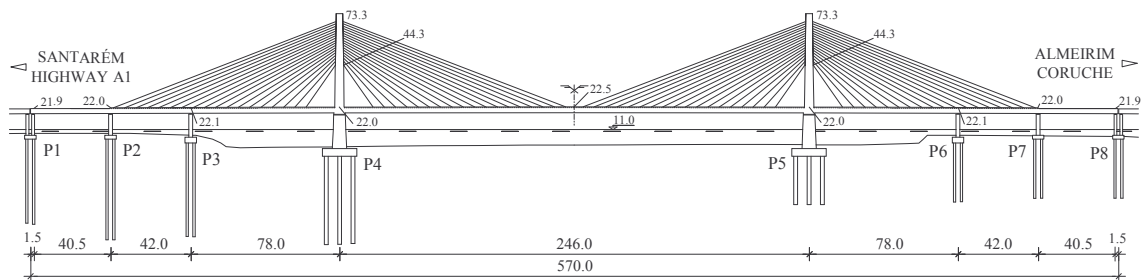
Elevation view of the Salgueiro Maia cable-stayed bridge
